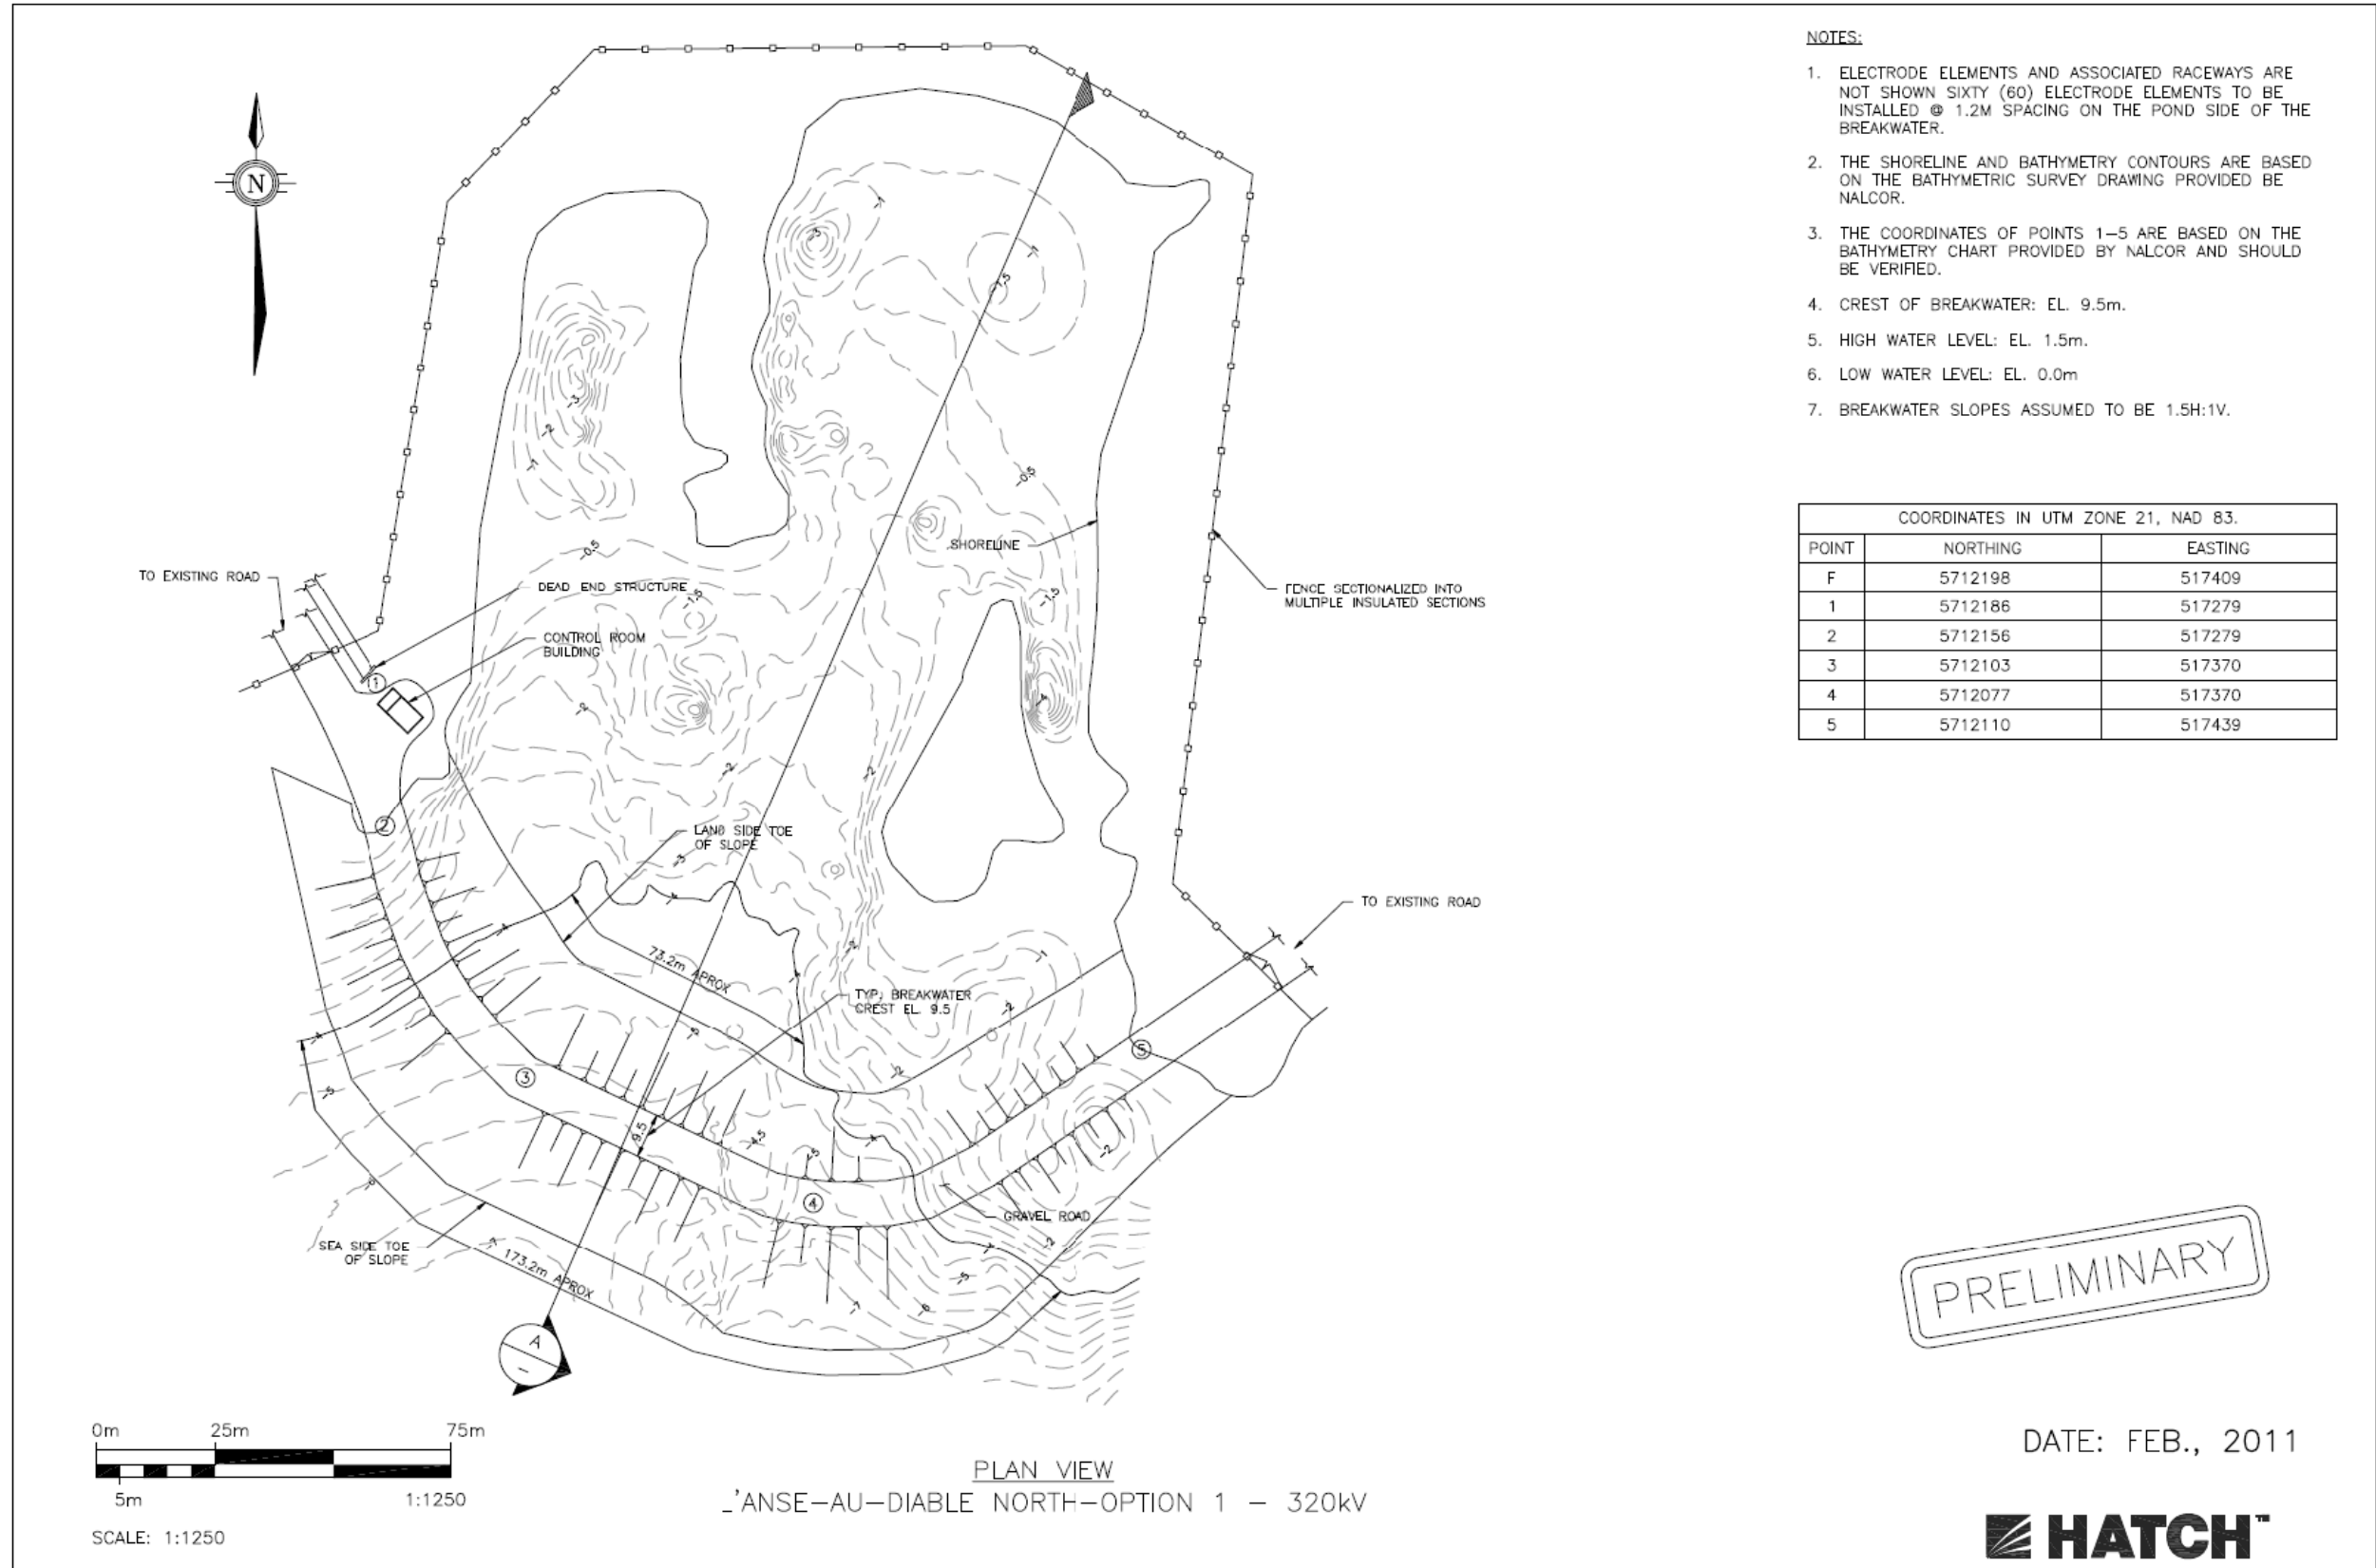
LAD North Shoreline Pond and Breakwater Plan
